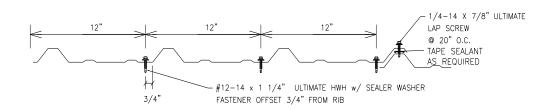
Super Span-X Metal Roofing Panel Secured to 16-Gauge Steel Purlins
